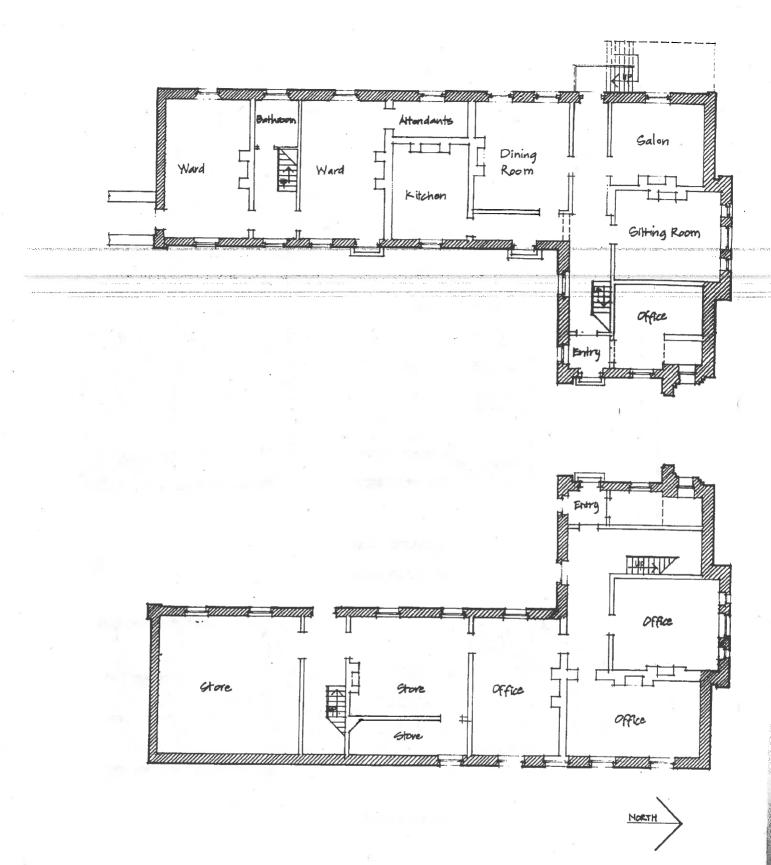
Suggested original layout of the Ground Floor of the Administration/Entrance Buildings
